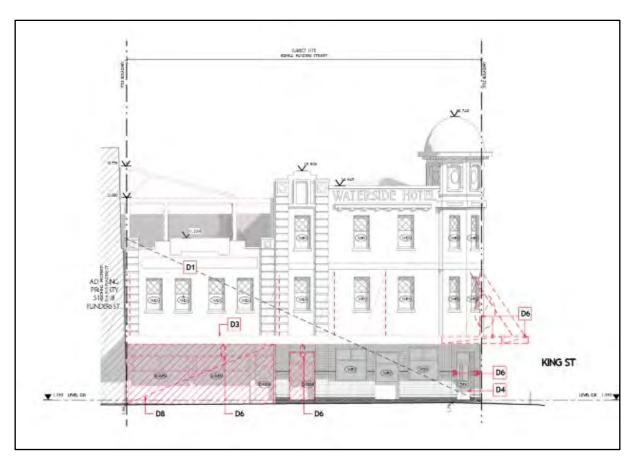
Demolition Elevation (Technē Architecture + Interior Design)
